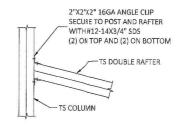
A SIDE EXTENSION RAFTER/COLUMN CONNECTION FOR RAFTER SPANS <=12'-0"
